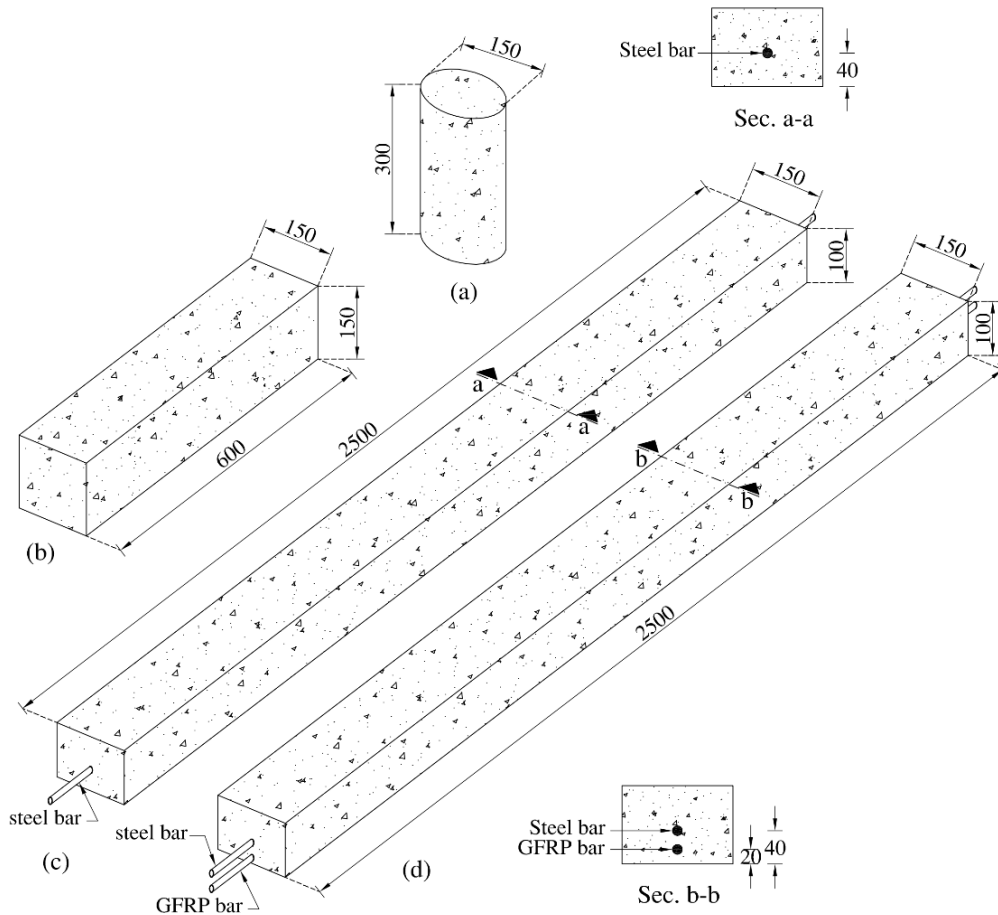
Geometry of the specimens: (a) standard cylinder for the uniaxial compression test; (b) SFRSCC beams used in three-point notched beam bending test; and beam reinforced longitudinally with (c) steel bar and (d) steel and GFRP bars used in four-point bending test (dimensions in mm)
